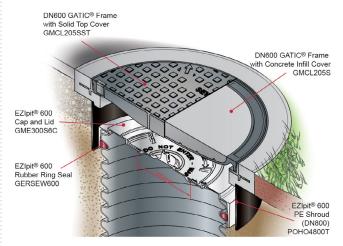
EZIpit® 600 Class B Concrete encased cover arrangement (Sloped surfaces).
